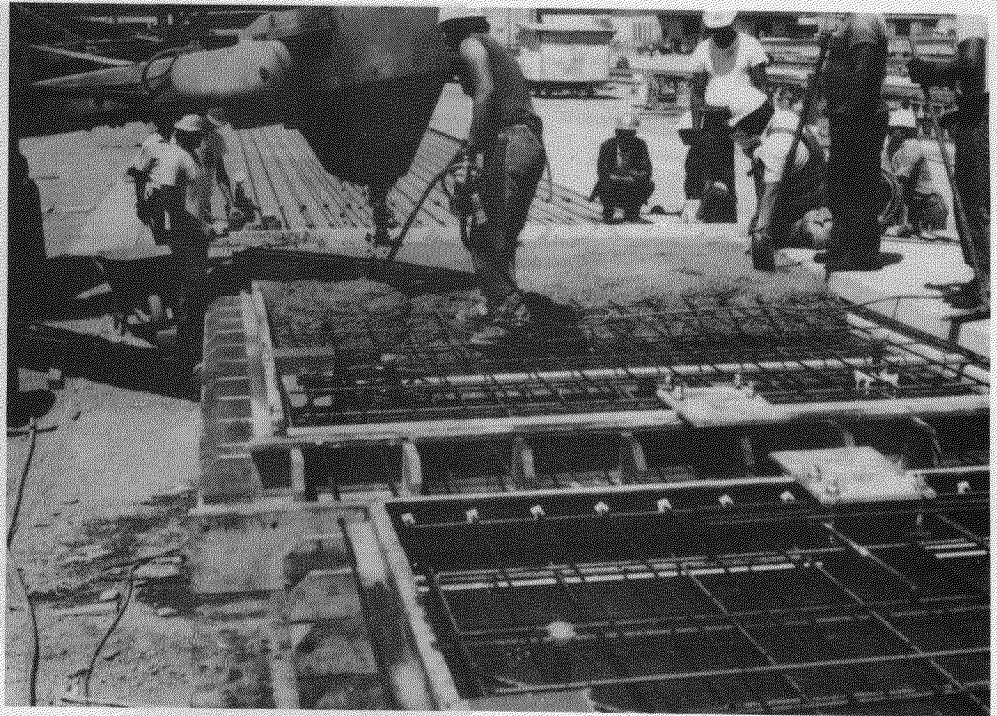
Precasting of laterally prestressed and transversely reinforced deck panels. "Tongue and groove" faces were match cast to adjacent panels to ensure uniform fit during posttensioning.
